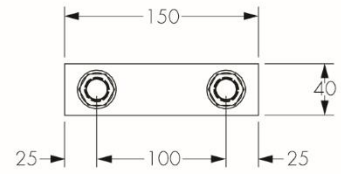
Schöck Isokorb T type S-N-D16 and type S-N-D22
